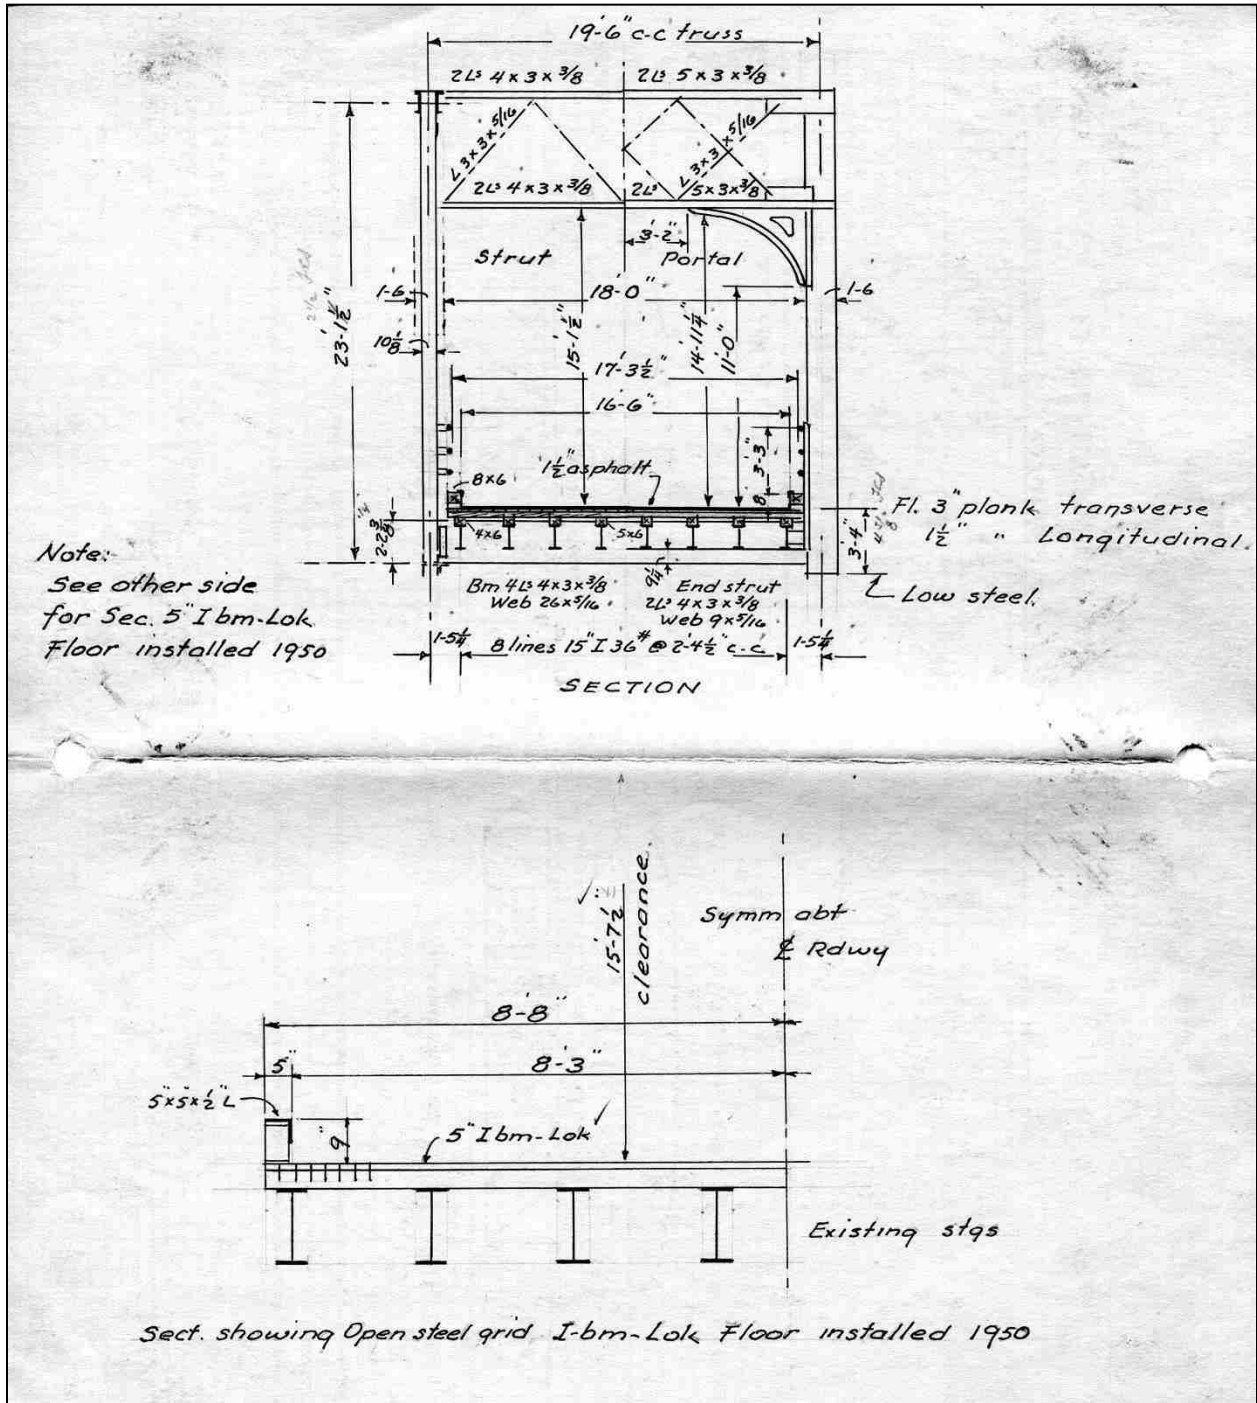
Sewall's Falls Bridge, section drawings. Field inspection sketches made by NHHD engineer Wendell H. Piper. Top sketch showing section through truss made May 15, 1942; bottom sketch showing section through steel deck added in 1950, made May 8, 1951 (NHHD Bridge Inventory Card, Concord 070/117).
